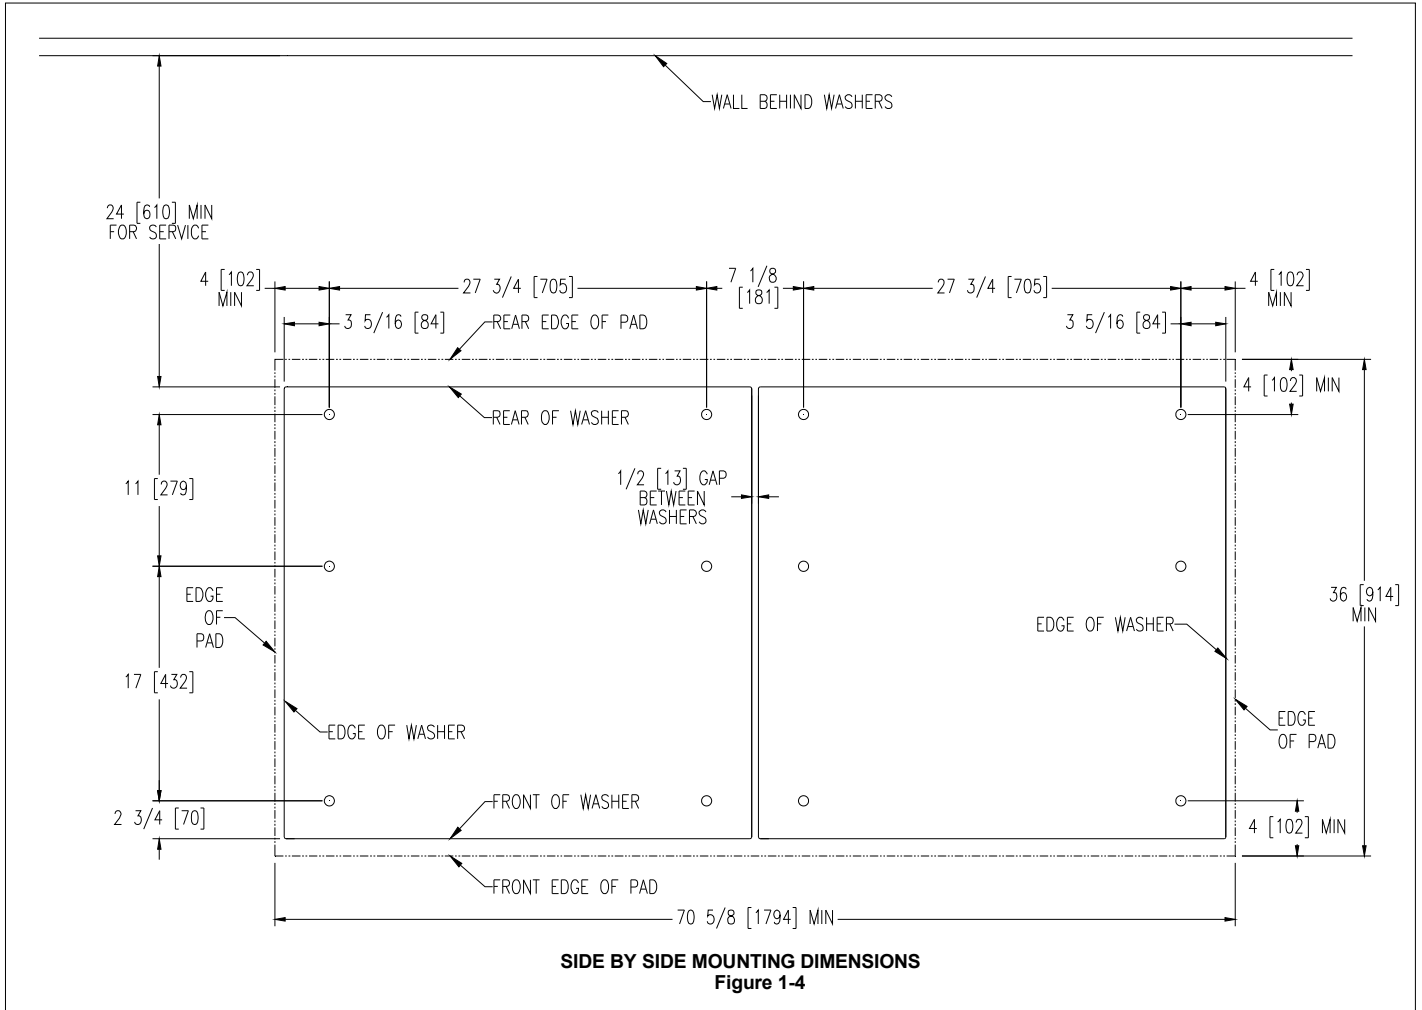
T-750 Machine Side By Side Mounting Detail
